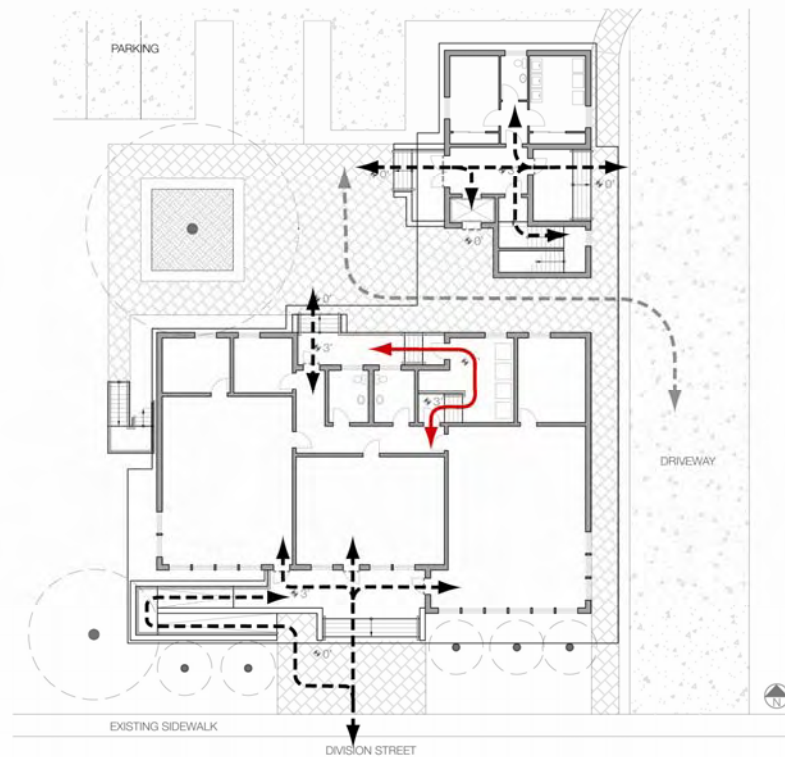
DIAGRAM: Means of egress with egress above dry floodproof construction (red).
